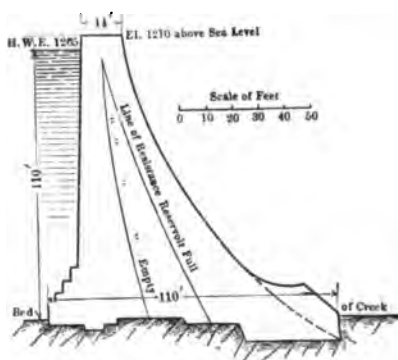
Cross-section of Beetaloo Dam, Australia.
